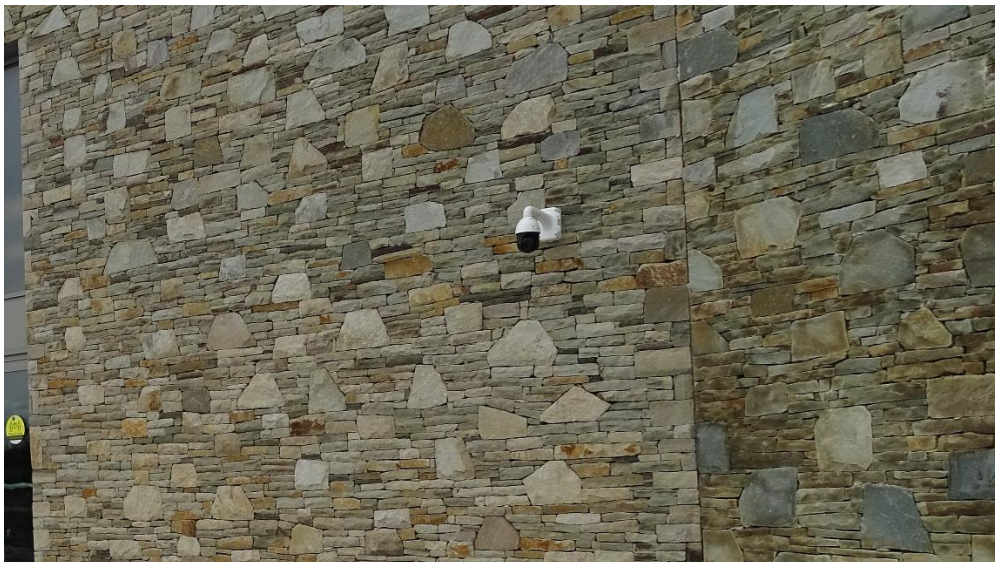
Plate A: Example of a natural stone facade with multiple crevices suitable as roosting sites for bats (Source: T. Aughney)
